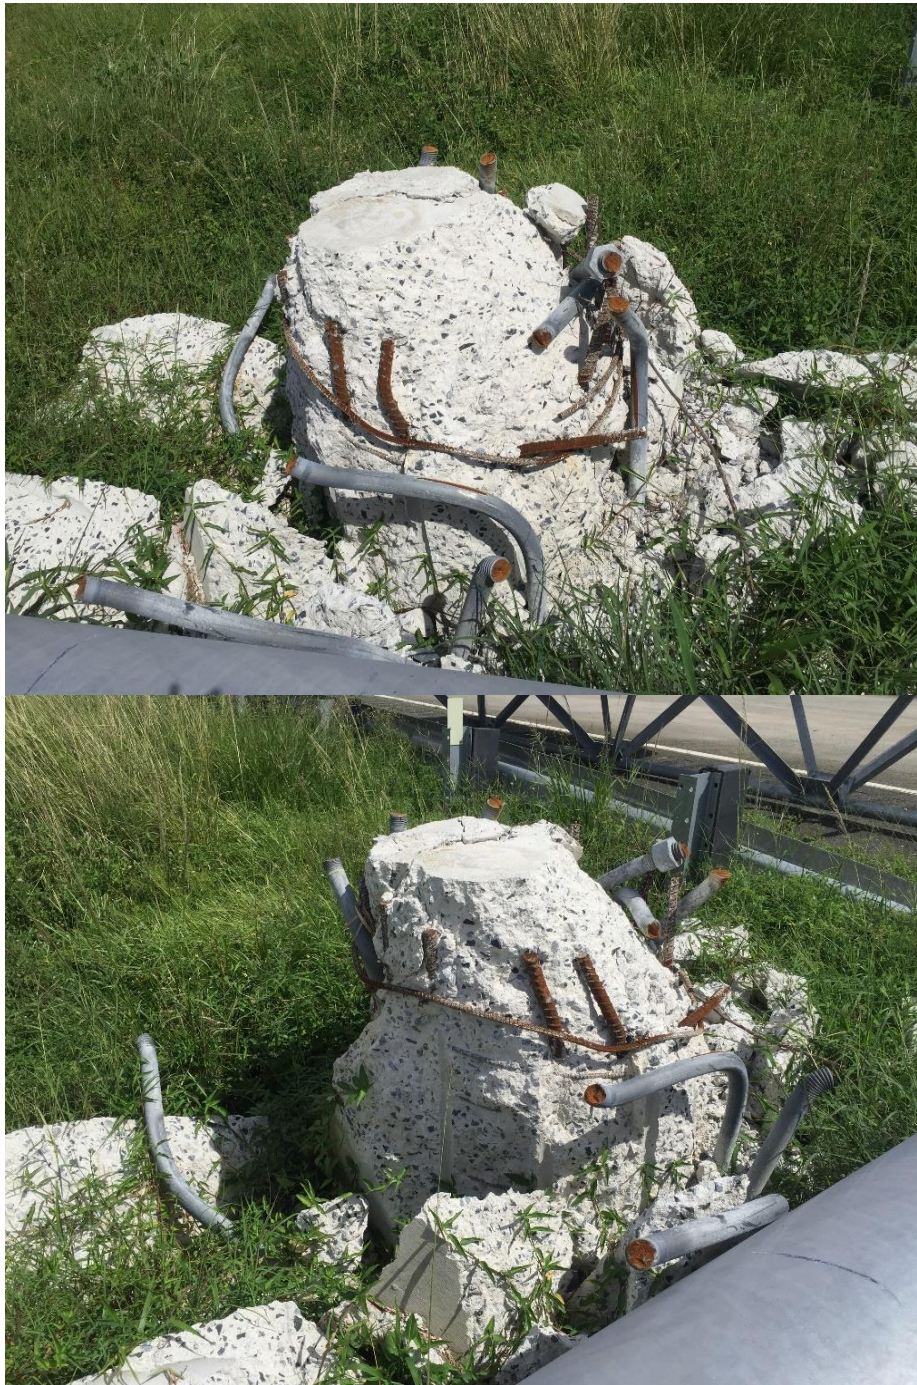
Several Anchor Bolts Outside the Transverse Confinement Steel / Concrete Core (Sign P-100)
